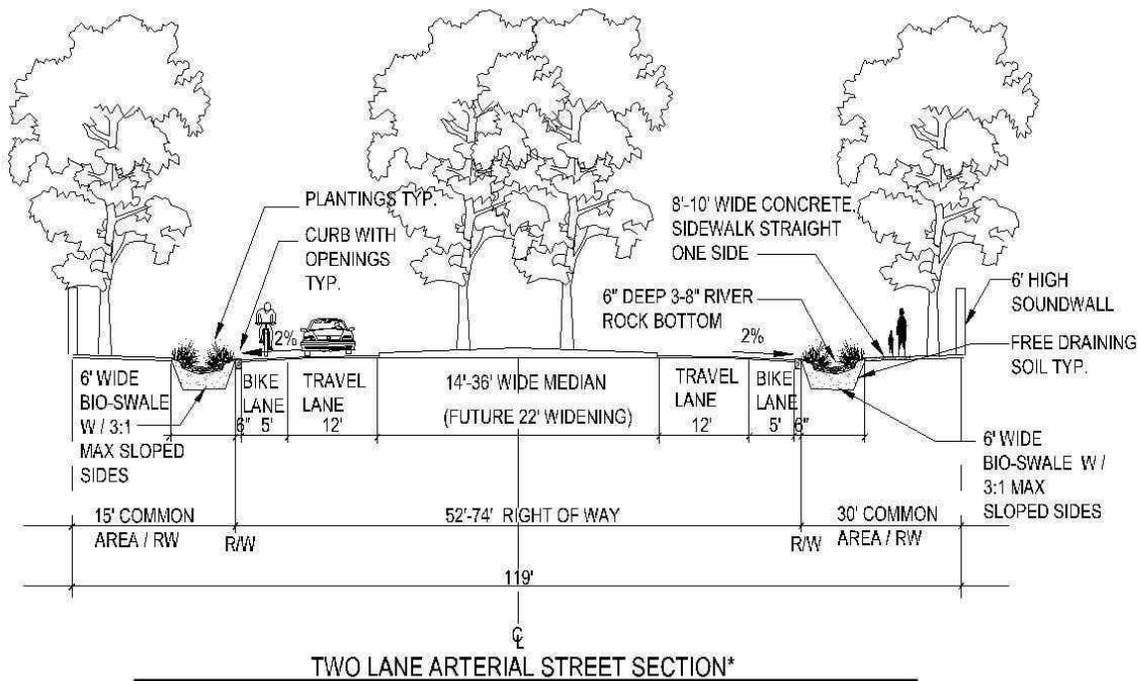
Typical Access Arterial South of Sonoma Highlands
